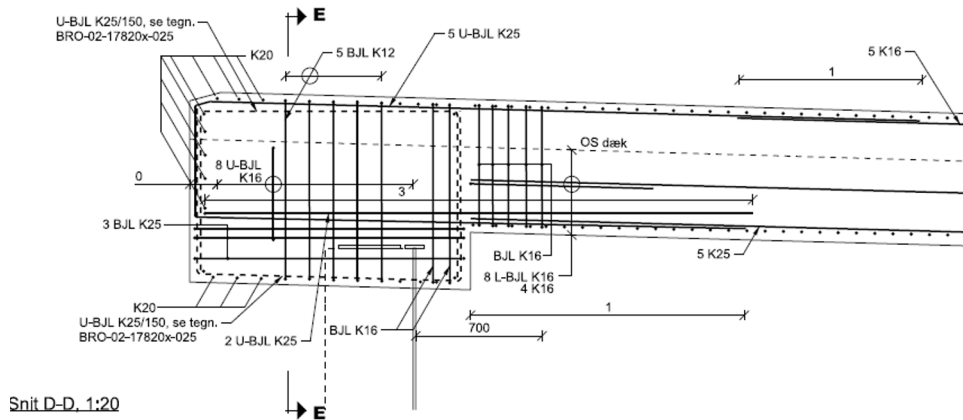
Detail of the connection between the superstructure, cap beam, and steel sheet pile.
